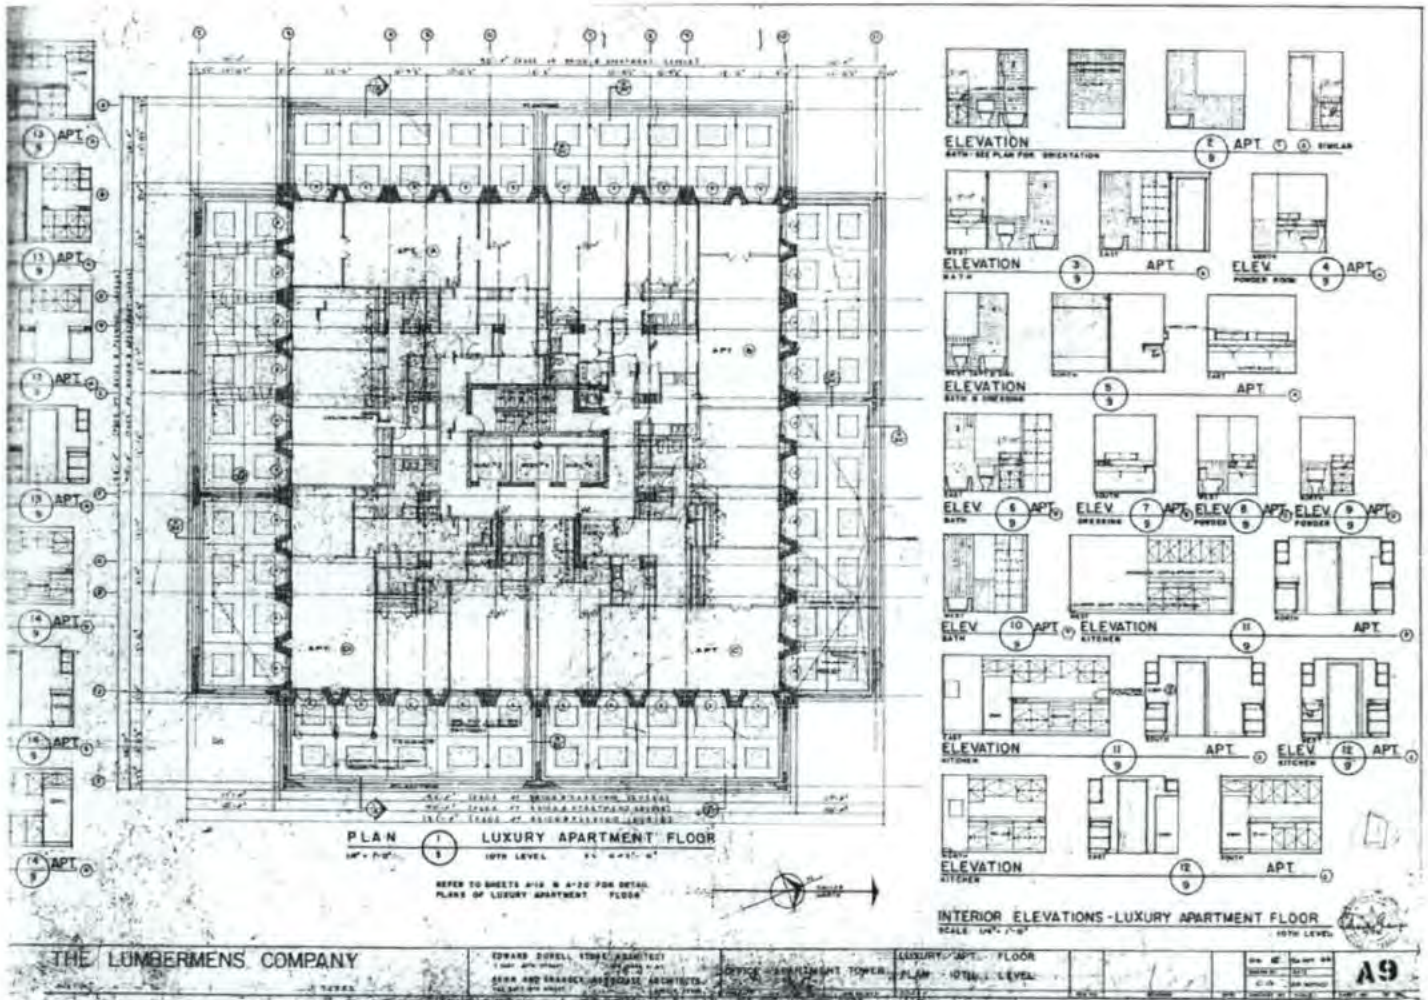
Plan for Level 10, luxury apartment floor with terraces.
